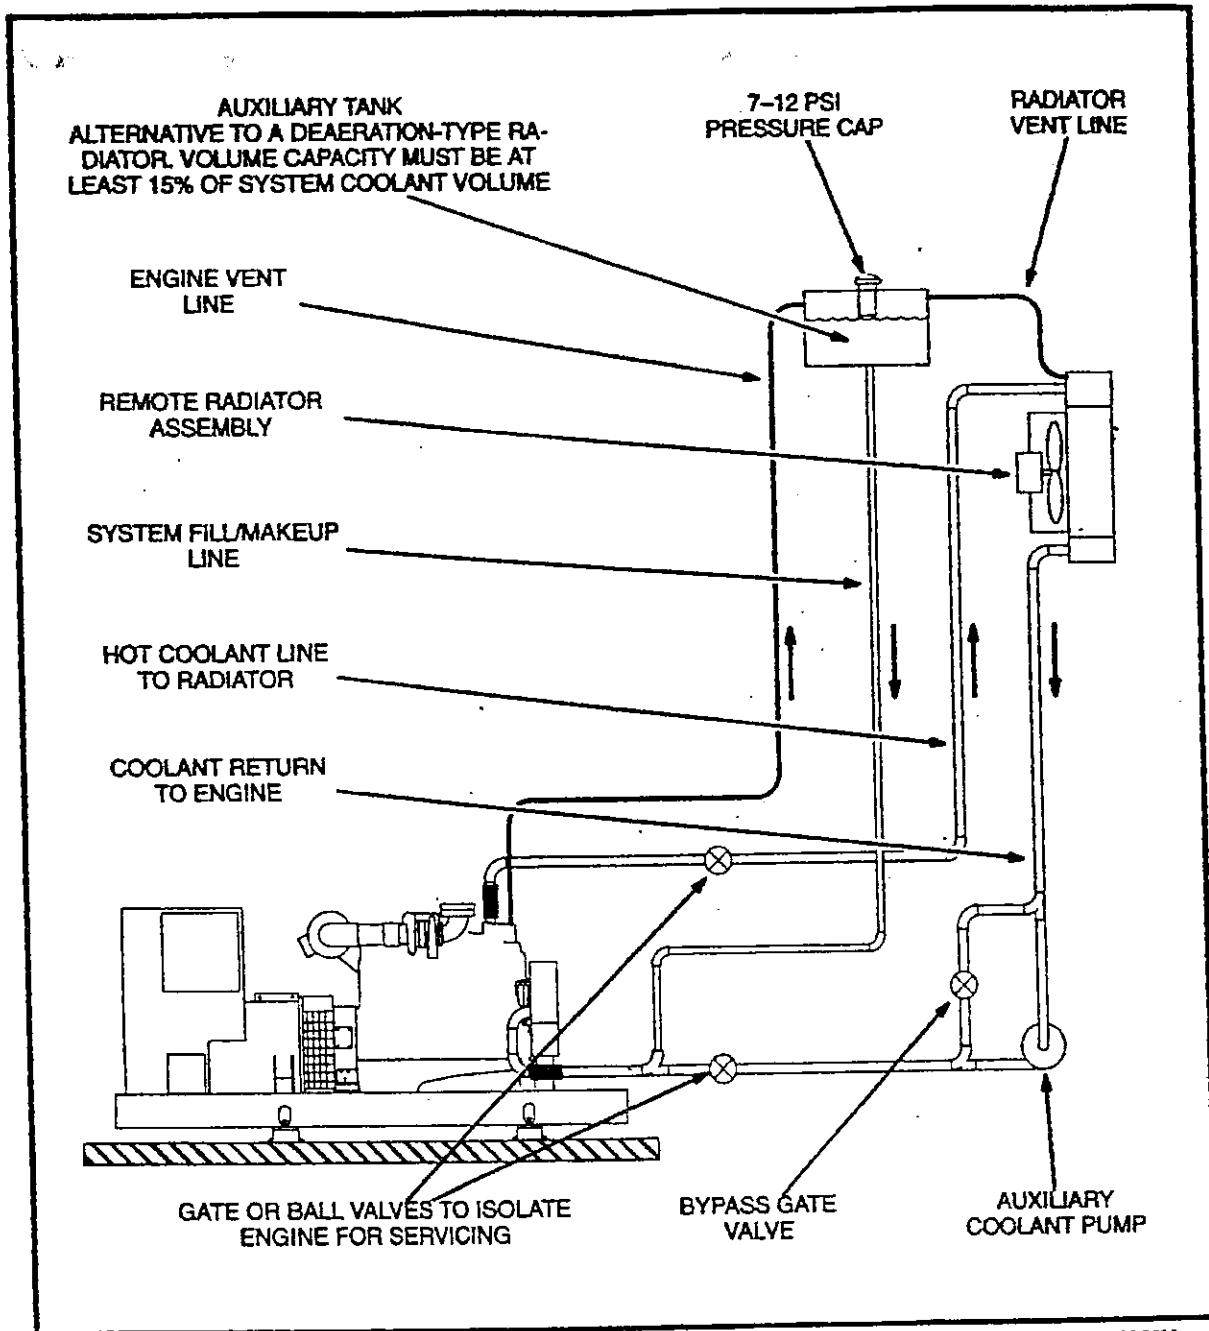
REMOTE RADIATOR WITH AUXILIARY COOLANT PUMP AND AUXILIARY TANK
